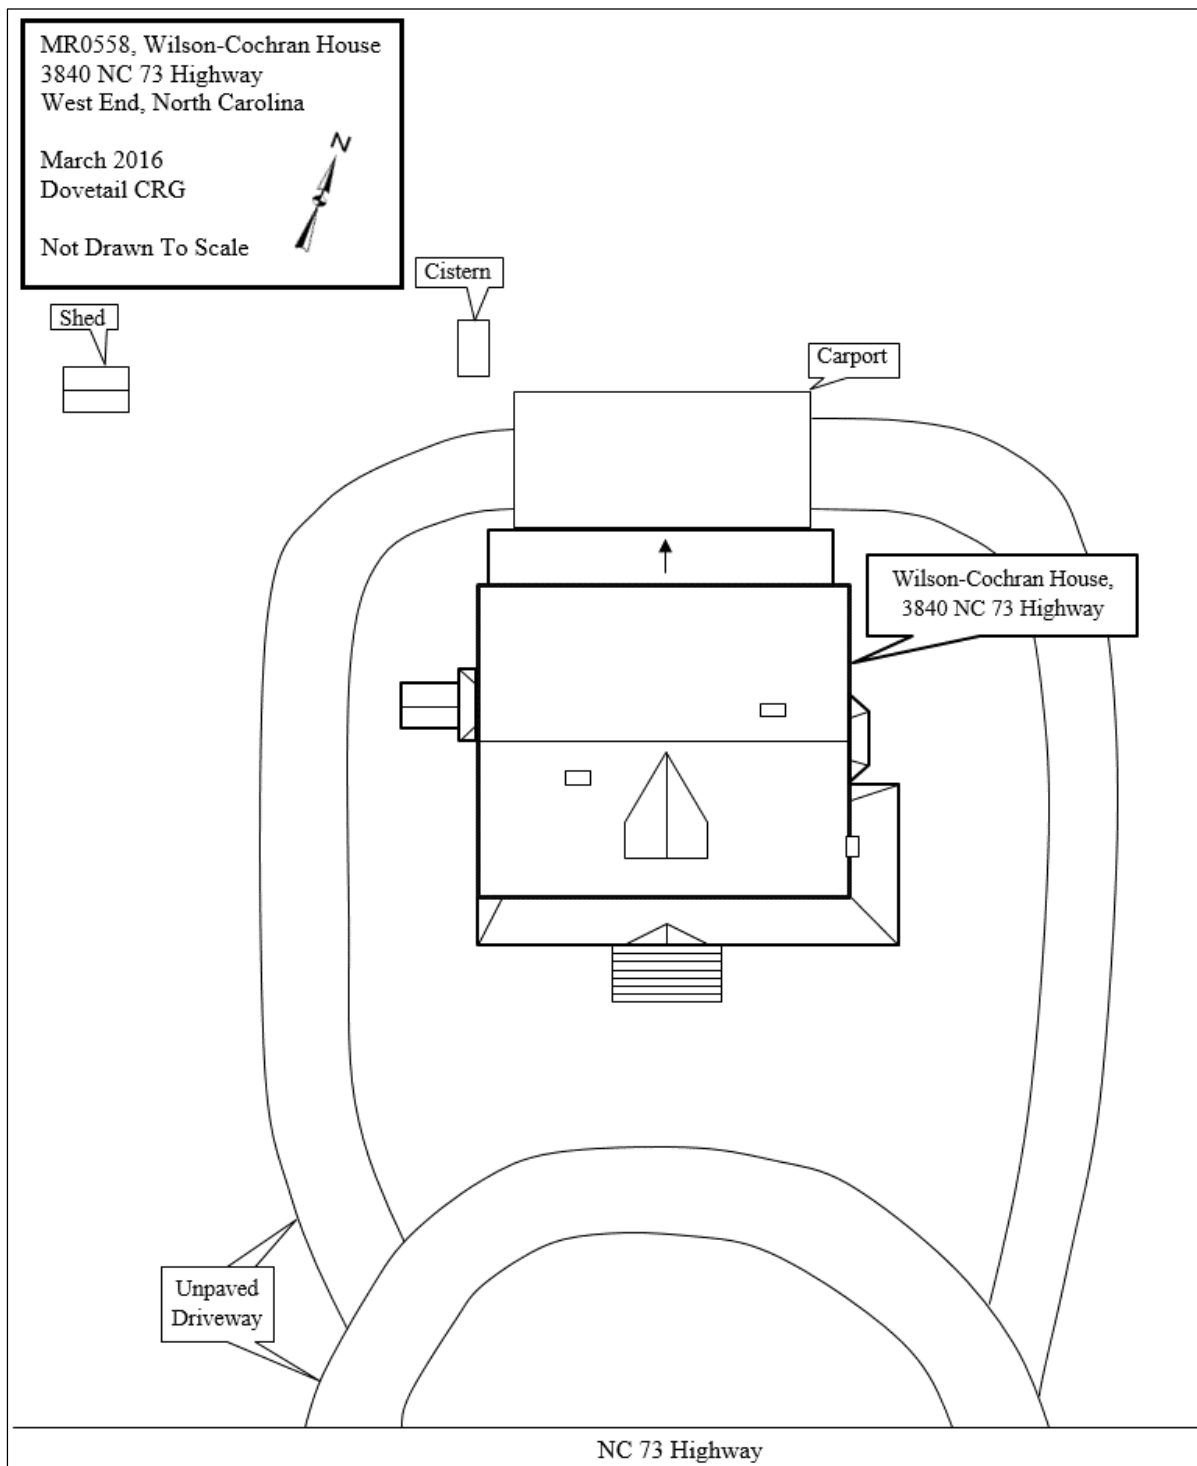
The Wilson-Cochran House (MR0558) Site Plan.
